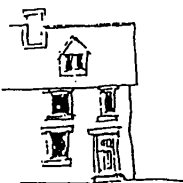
Gaps between dwellings which afford views of interest through and beyond the development as a whole should be retained.
